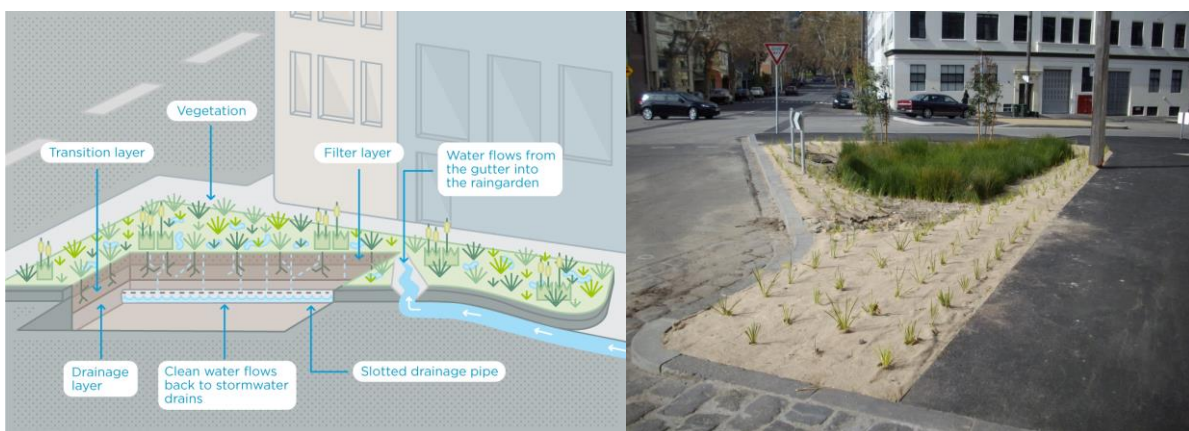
Example stormwater garden configuration (source: <http://urbanwater.melbourne.vic.gov.au>)
